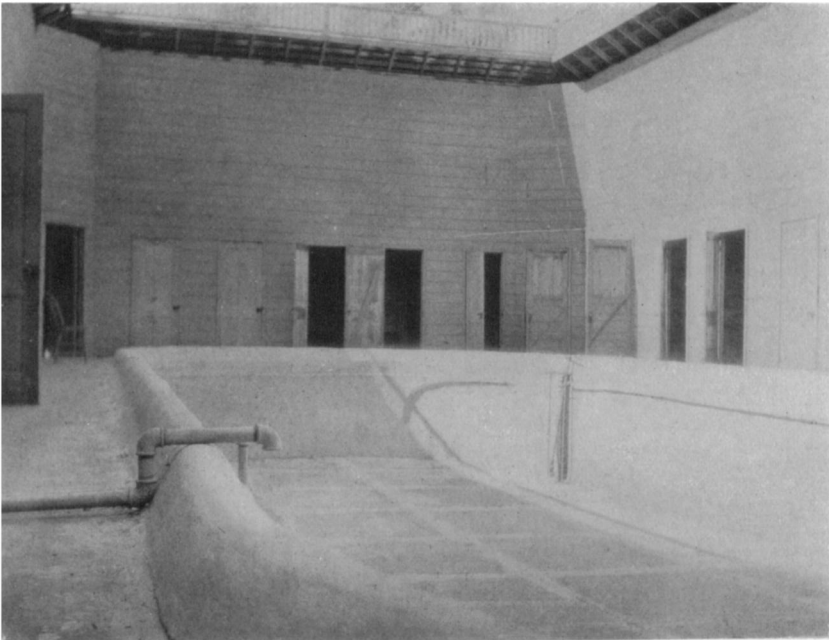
INTERIOR OF BATH HOUSE AND SWIMMING POOL
